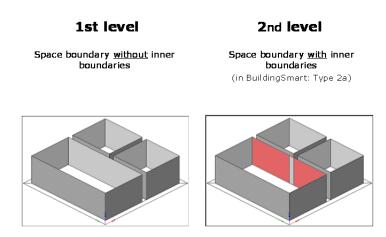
Space Boundary levels (1st and 2nd, buildingSMART)
